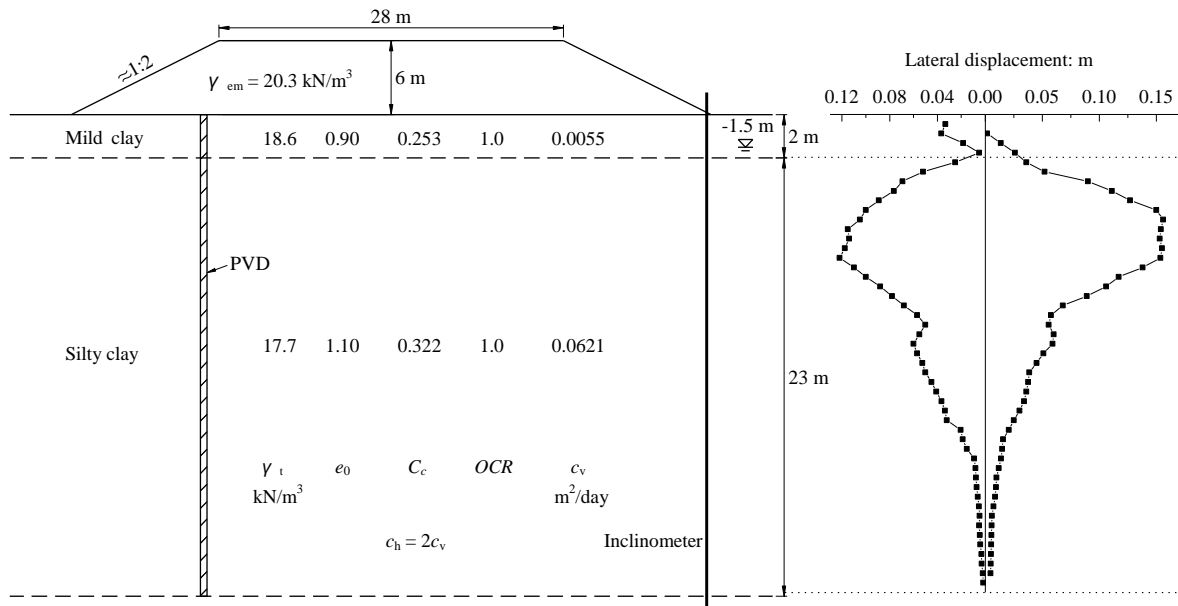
Cross-section of embankment, soil profile and lateral displacement profile of Case 8
